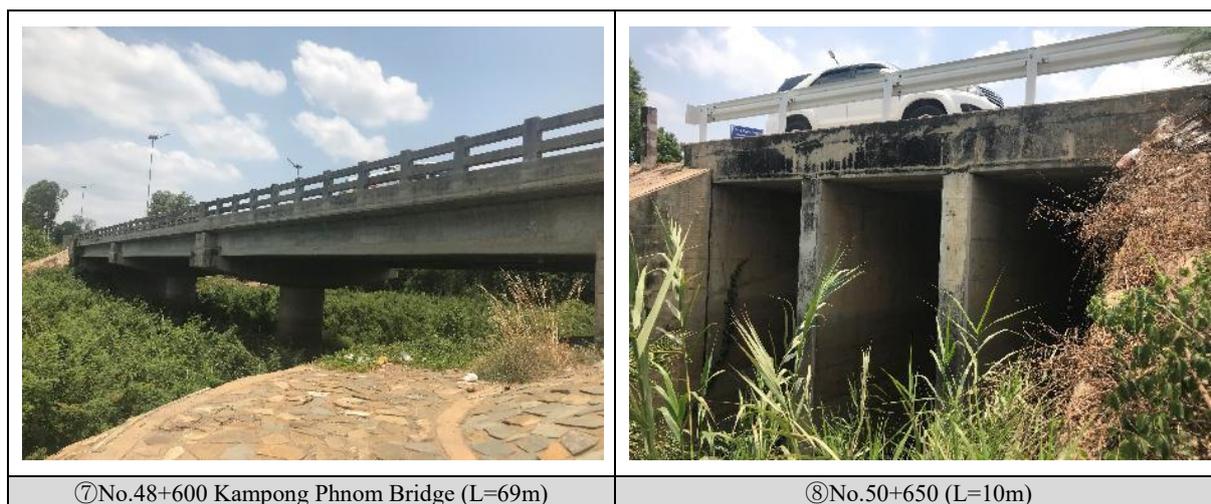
Existing Road Structure of NR1 (20-54 km)
